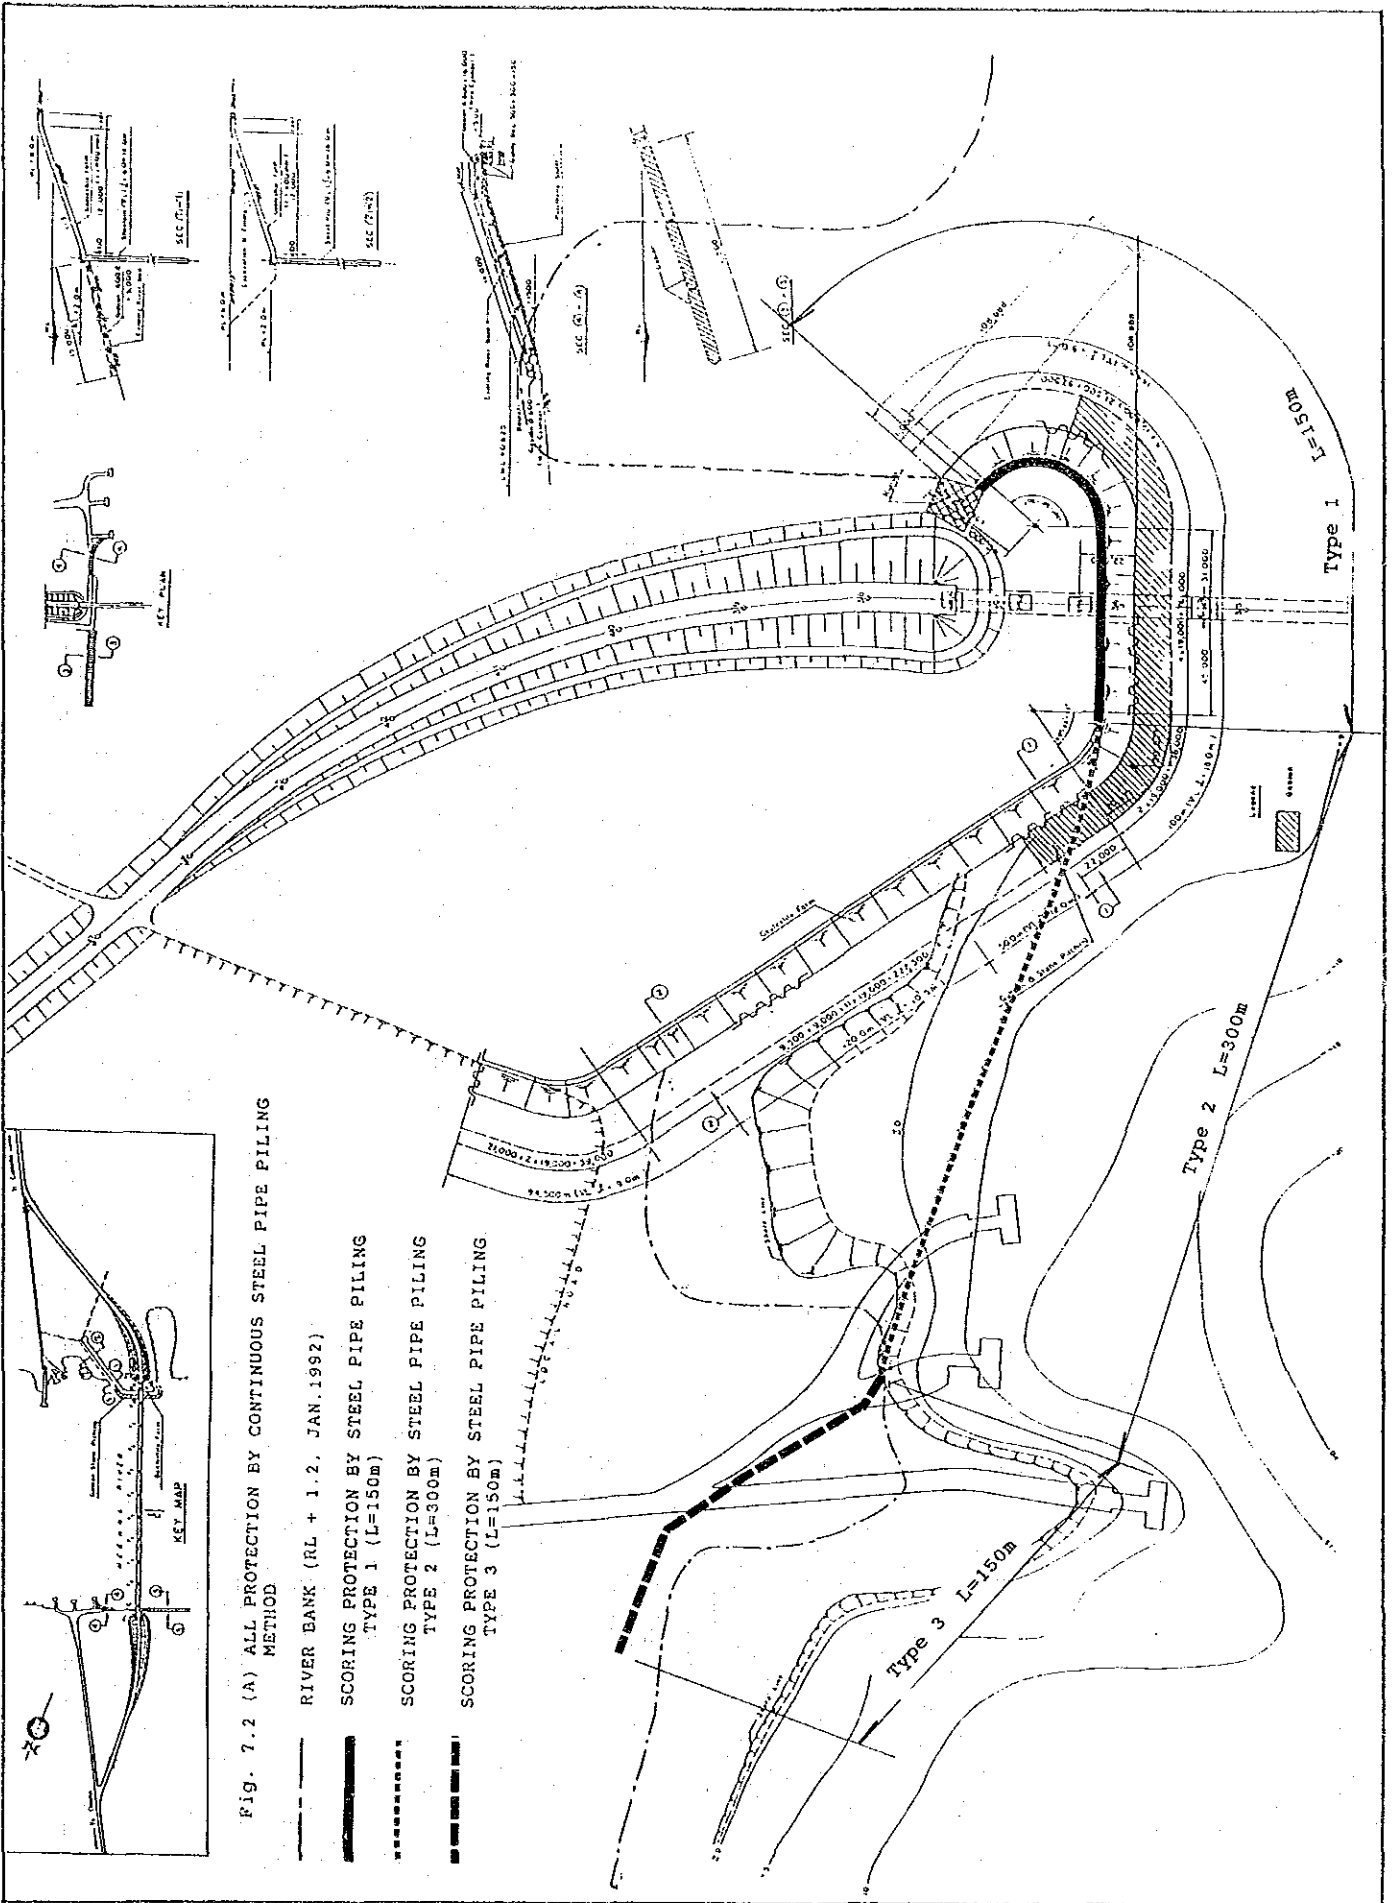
(A) ALL PROTECTION BY CONTINUOUS STEEL PIPE PILING METHOD
